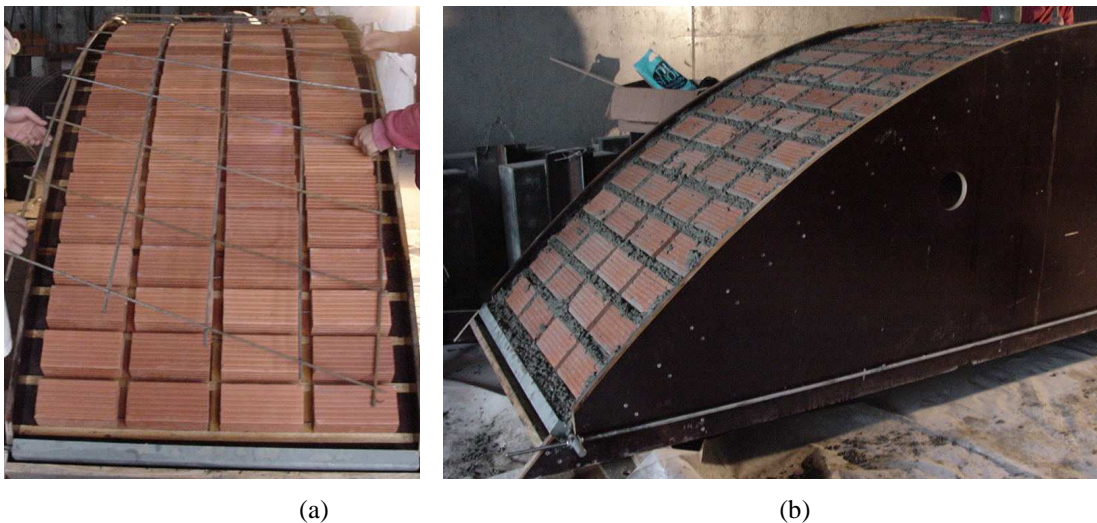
Construction process: (a) Placing the longitudinal and transversal reinforcement;
